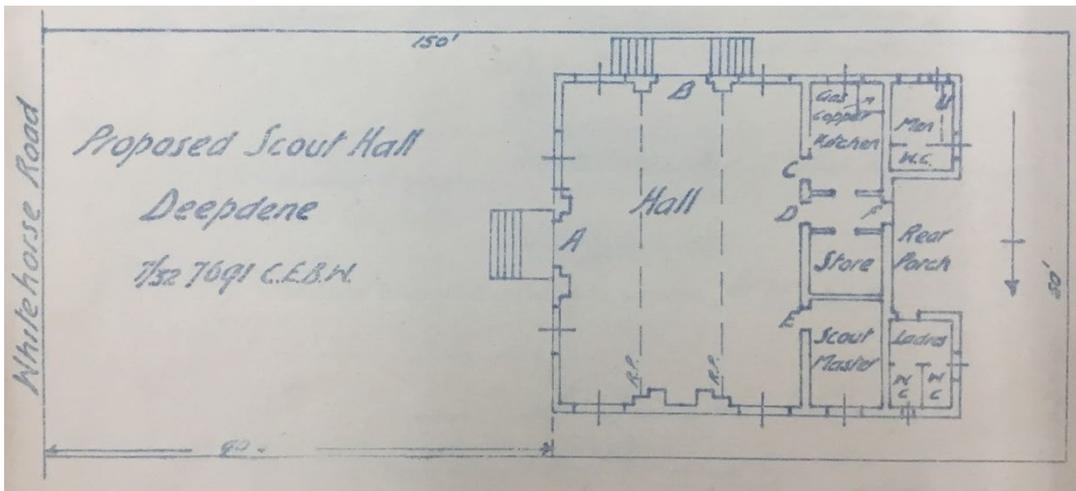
Original layout of Deepdene Scout Hall, c.1932. (Source: Public Building file, PROV)
